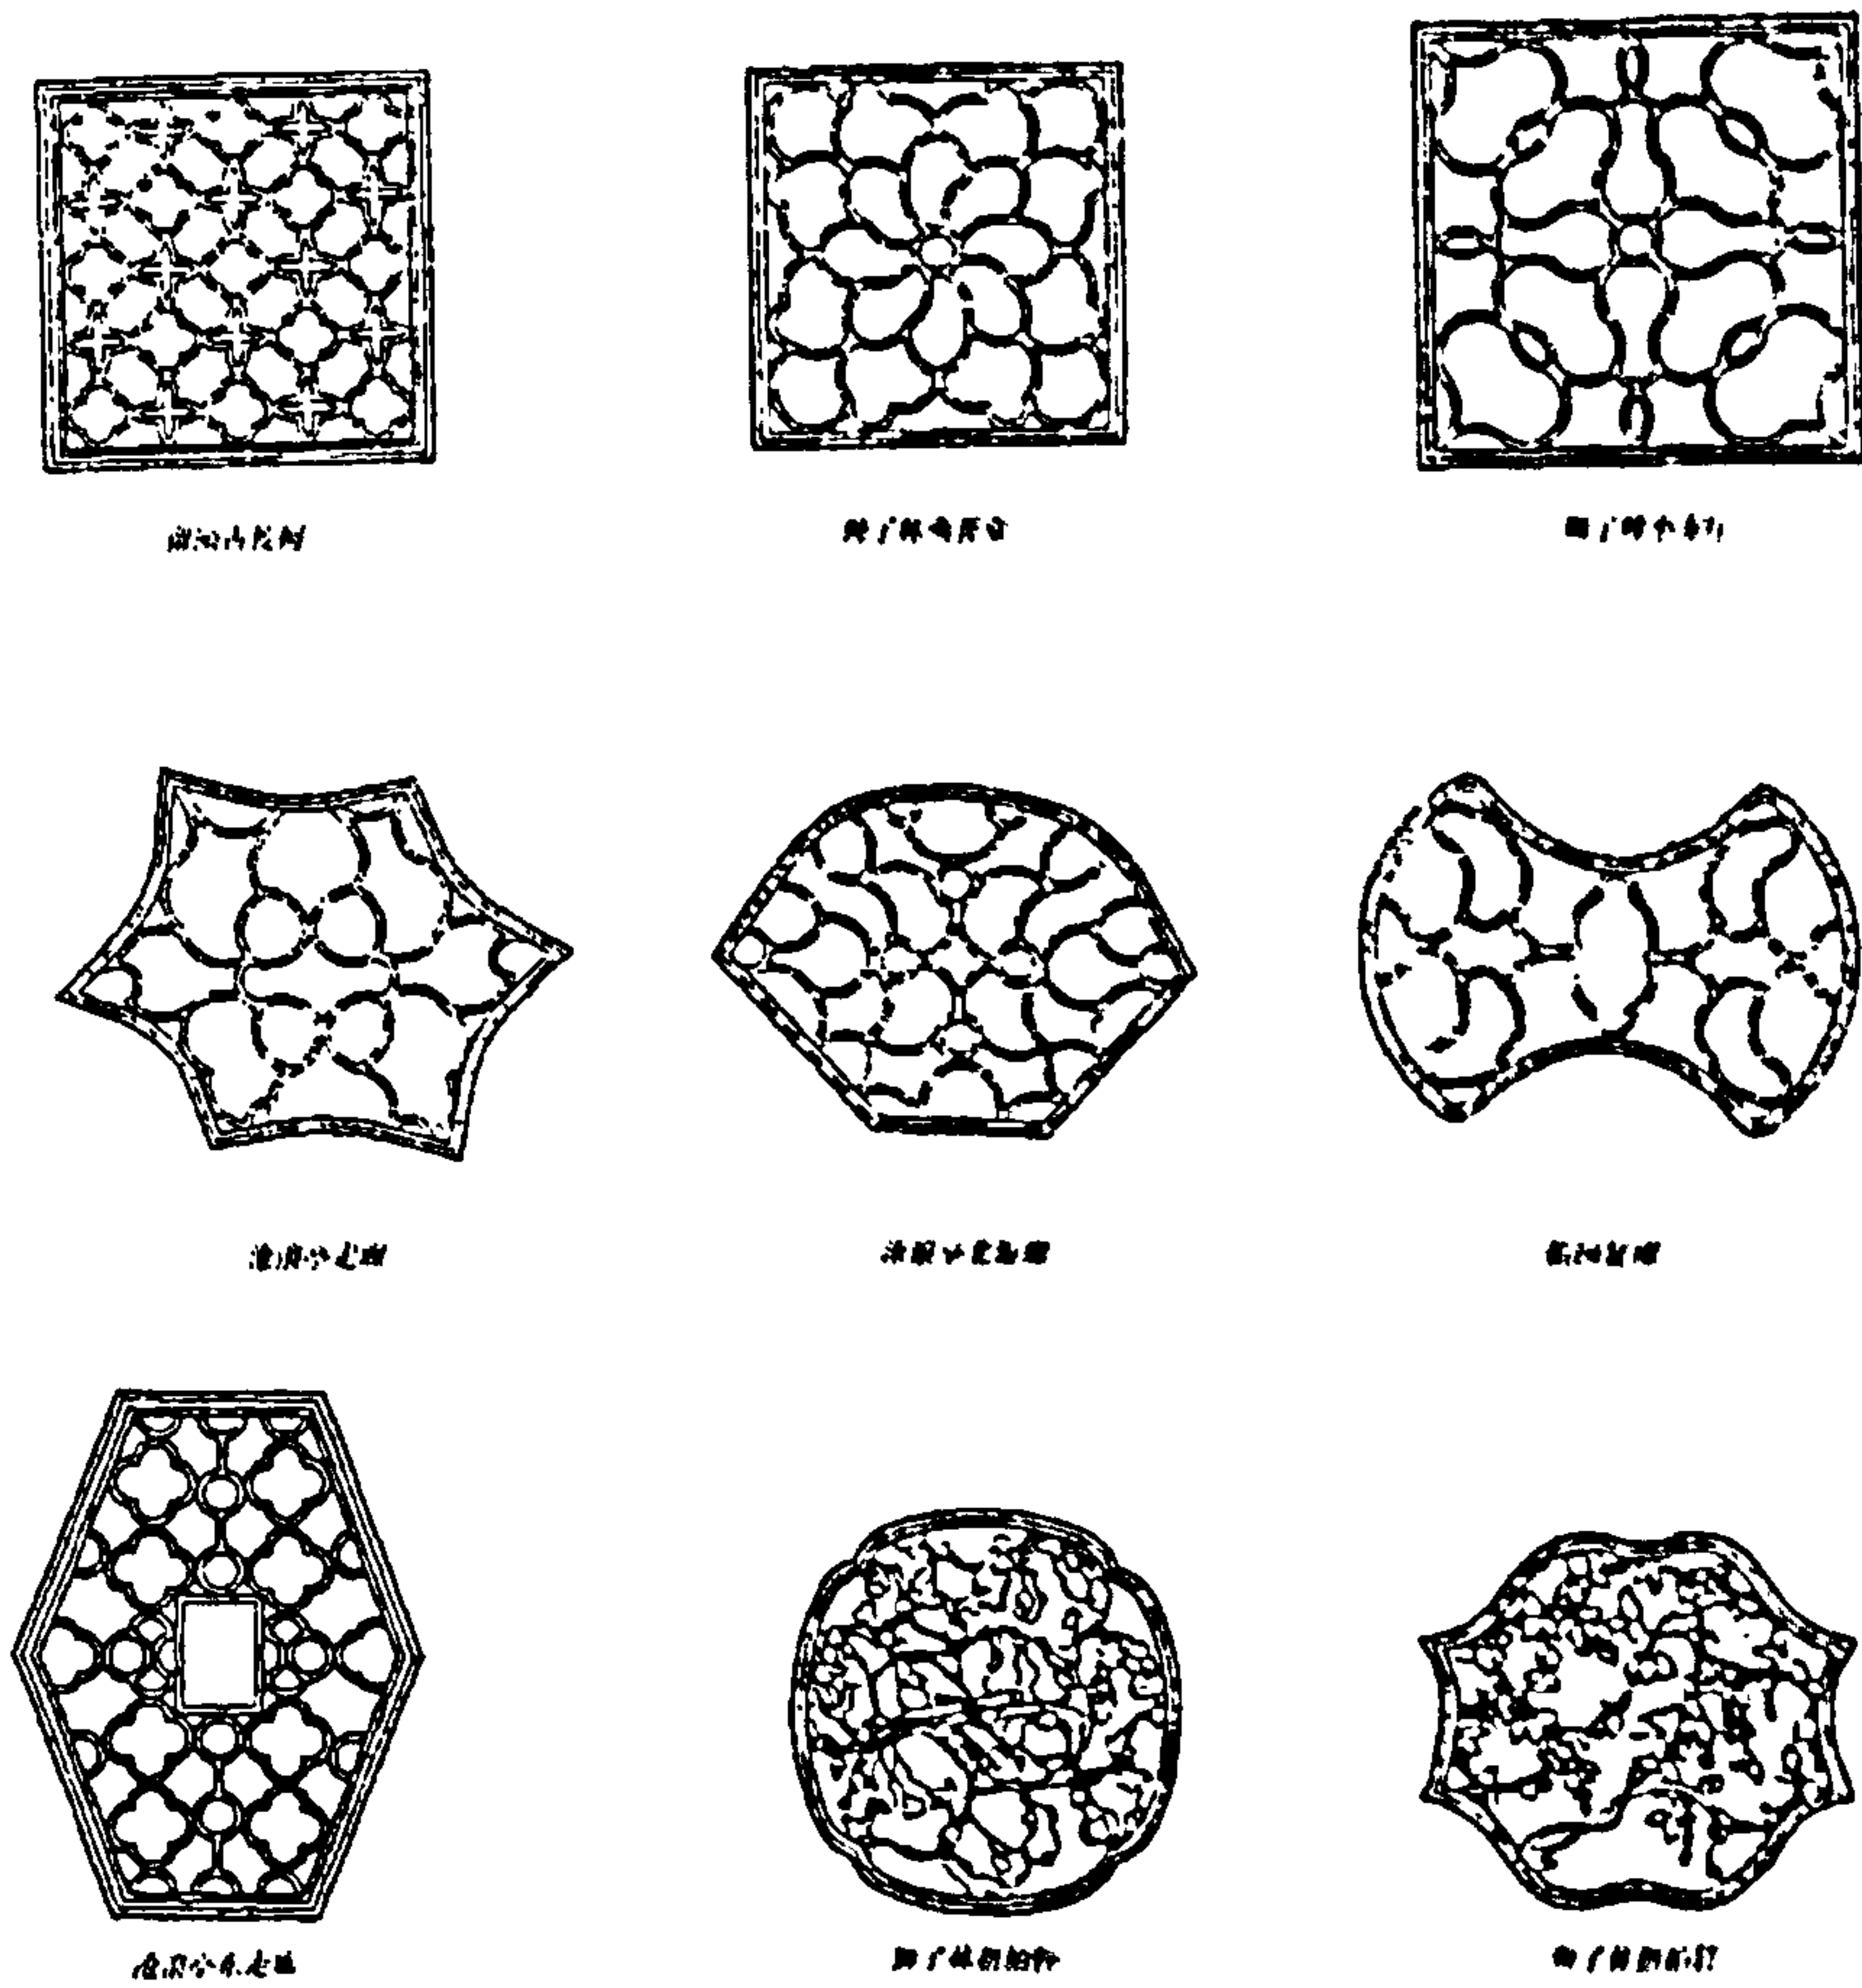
The Patterns of Openings in Jiang Nan Garden
